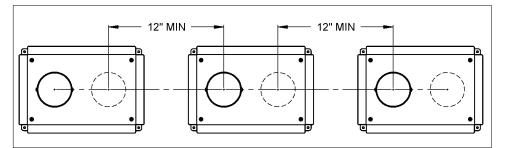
Minimum separations for multiple vent installation - horizontal orientation
